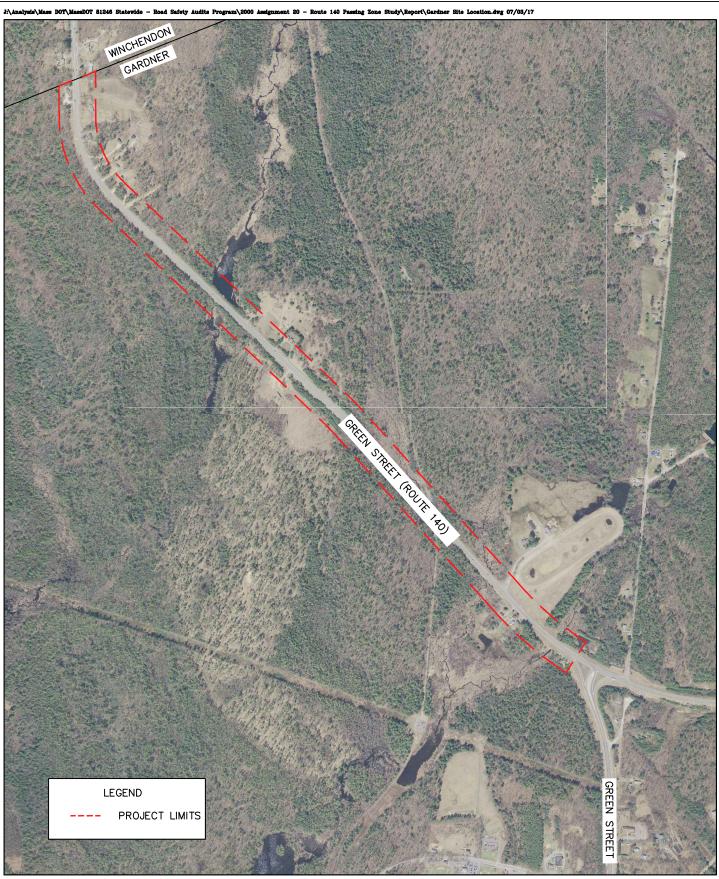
Project Location Green Street (Route 140) Roadway Resurfacing Gardner, Massachusetts
